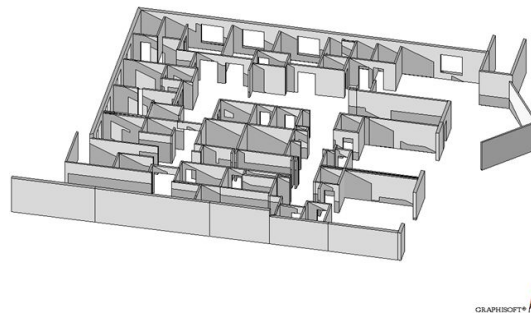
Part of the typical floor plan of an object oriented CAD model of building 10 at RPAH, Sydney modelled in the ArchiCAD package.
